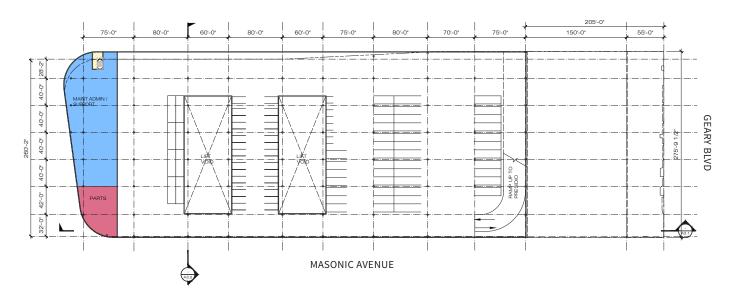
BUS FACILITY CONCEPT DESIGN - BASEMENT LEVEL PLAN
